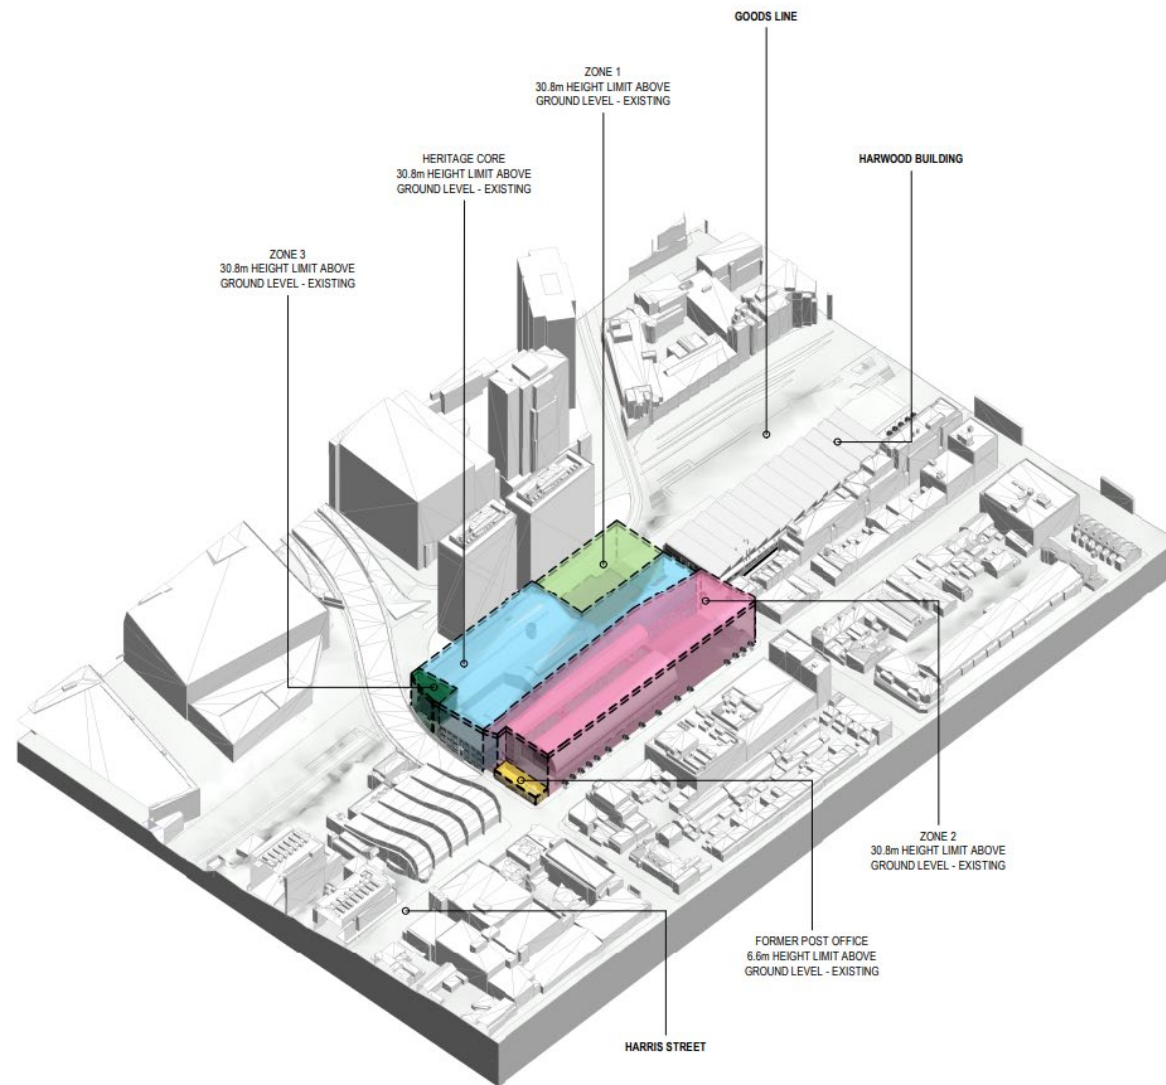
Ultimo Powerhouse- Building Envelope 3D Views (Source: John Wardle Architects, 17 May 2022)
